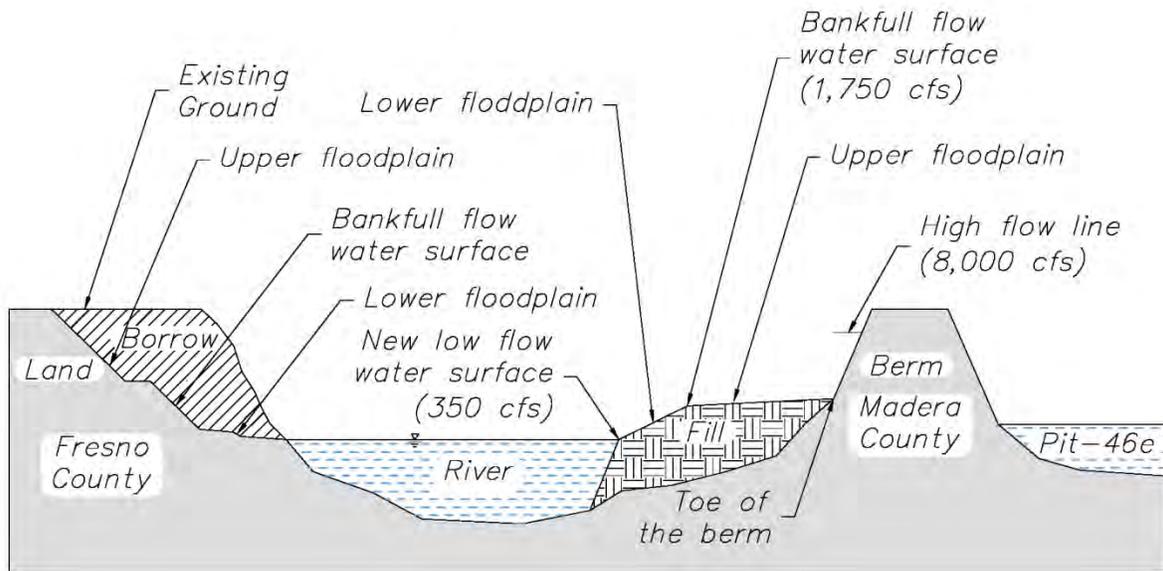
Conceptual Floodplain Diagram (looking downstream)
